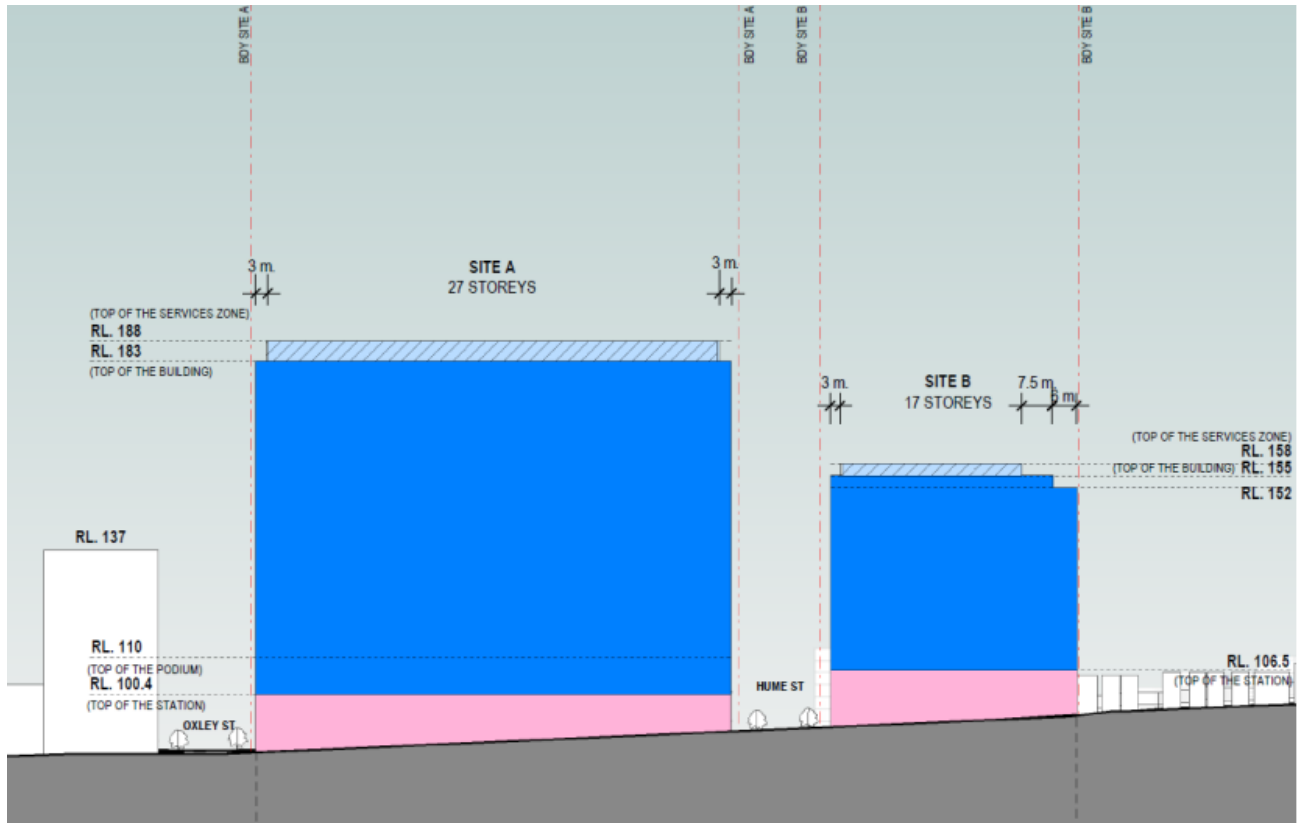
Proposed Crows Nest OSD building envelope – West Elevation (Pacific Highway)
